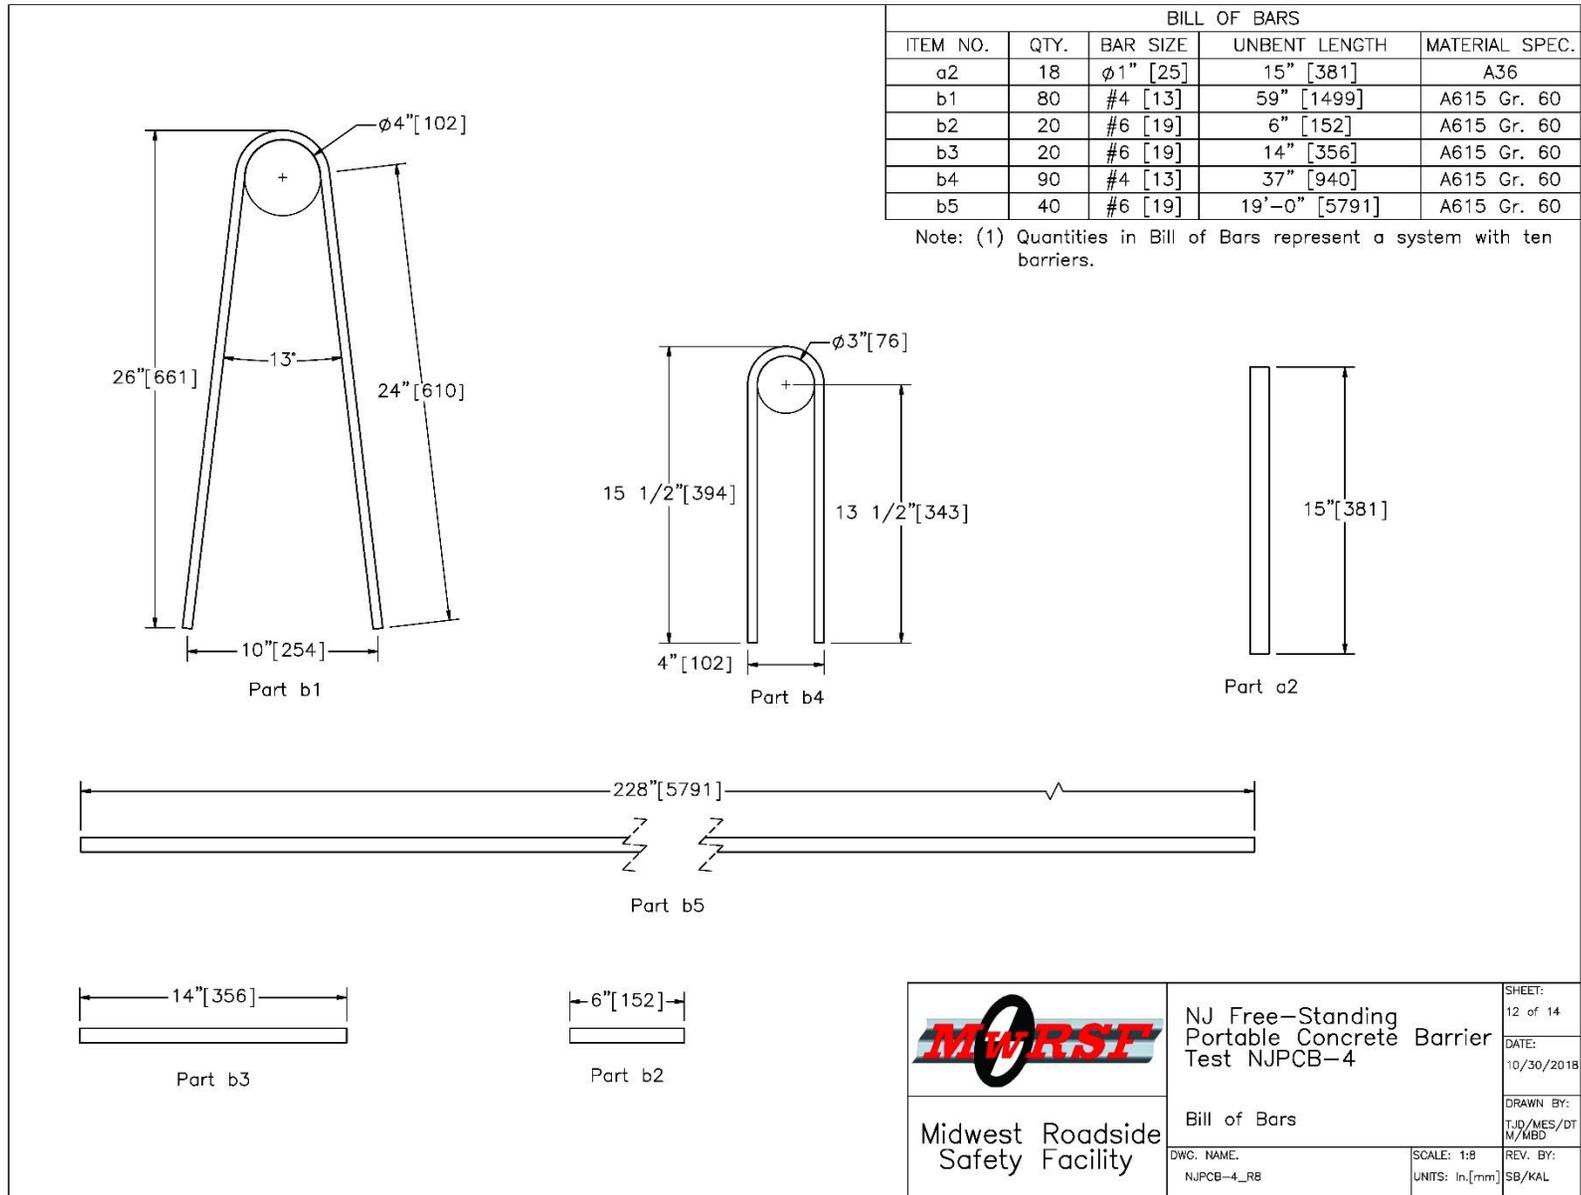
PCB Reinforcement Details, Test No. NJPCB-4
